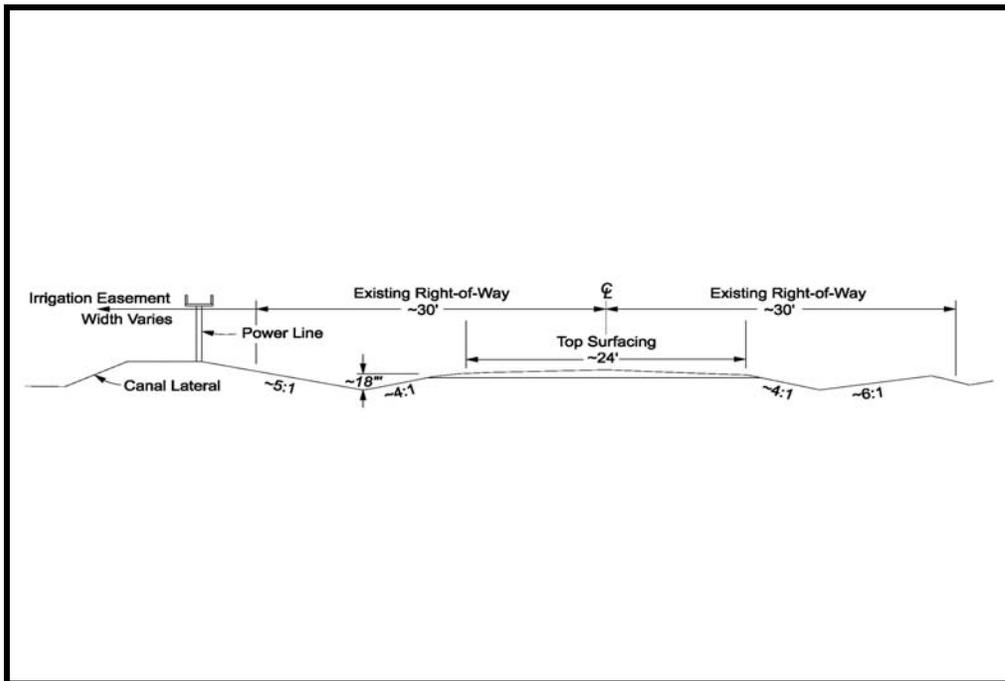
The Existing Section Between Canyon Ferry Road and York Road.
